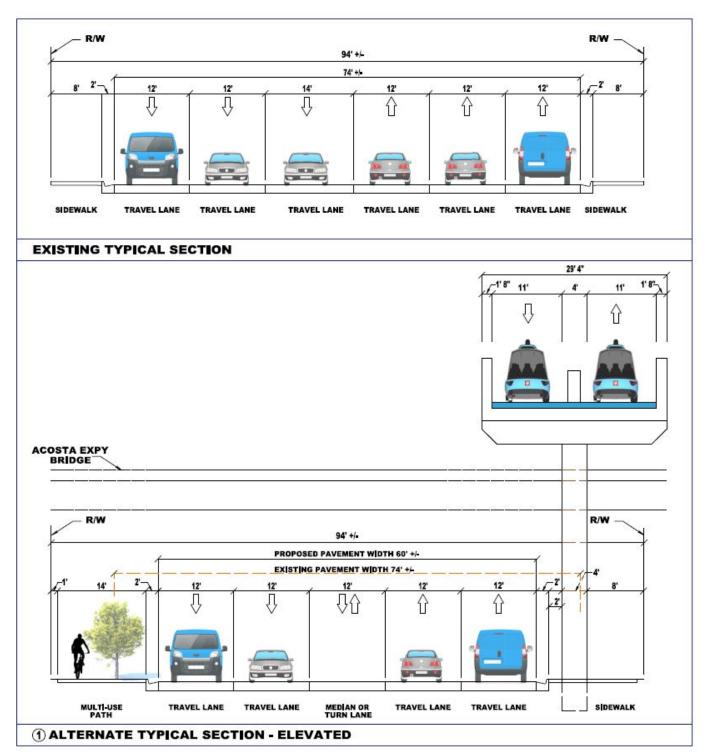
South Corridor Existing and Alternate Elevated Section San Marco Blvd and Acosta Expy
